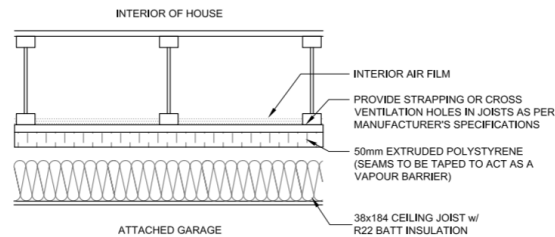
Hot Stuff – Best way to construct a warm floor. Continuous rigid insulation coupled with an airspace above cavity insulation.
